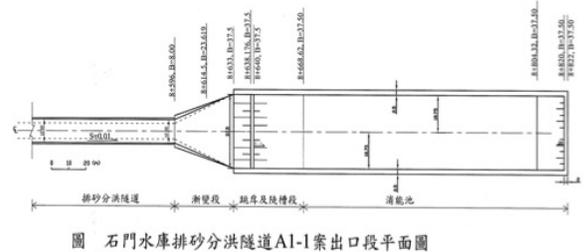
Shihmen Diversion Tunnel A1-1 Outlet Longitudinal Design Section
